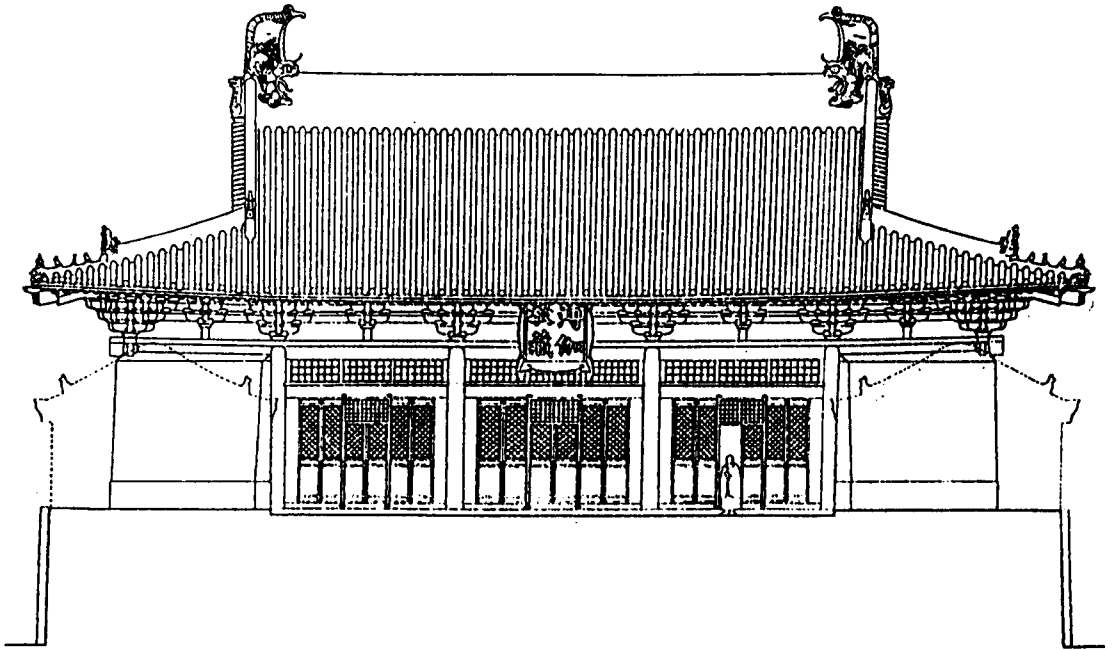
Front elevation of a building in China built in the eleventh century.*⁹⁹
